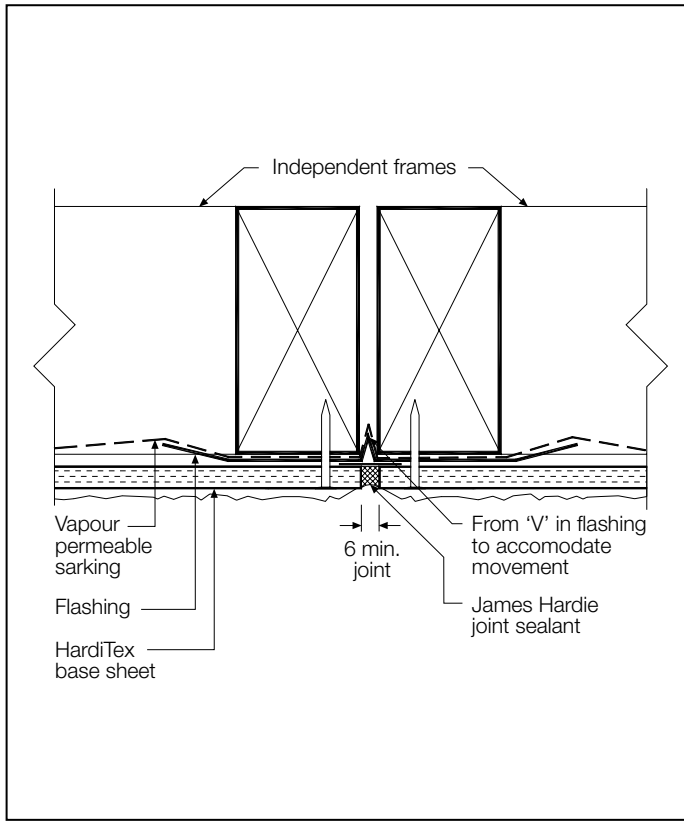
VERTICAL MOVEMENT JOINT IN HARDITEX WALL (CONTROL JOINT REQUIRED BY DESIGN)
